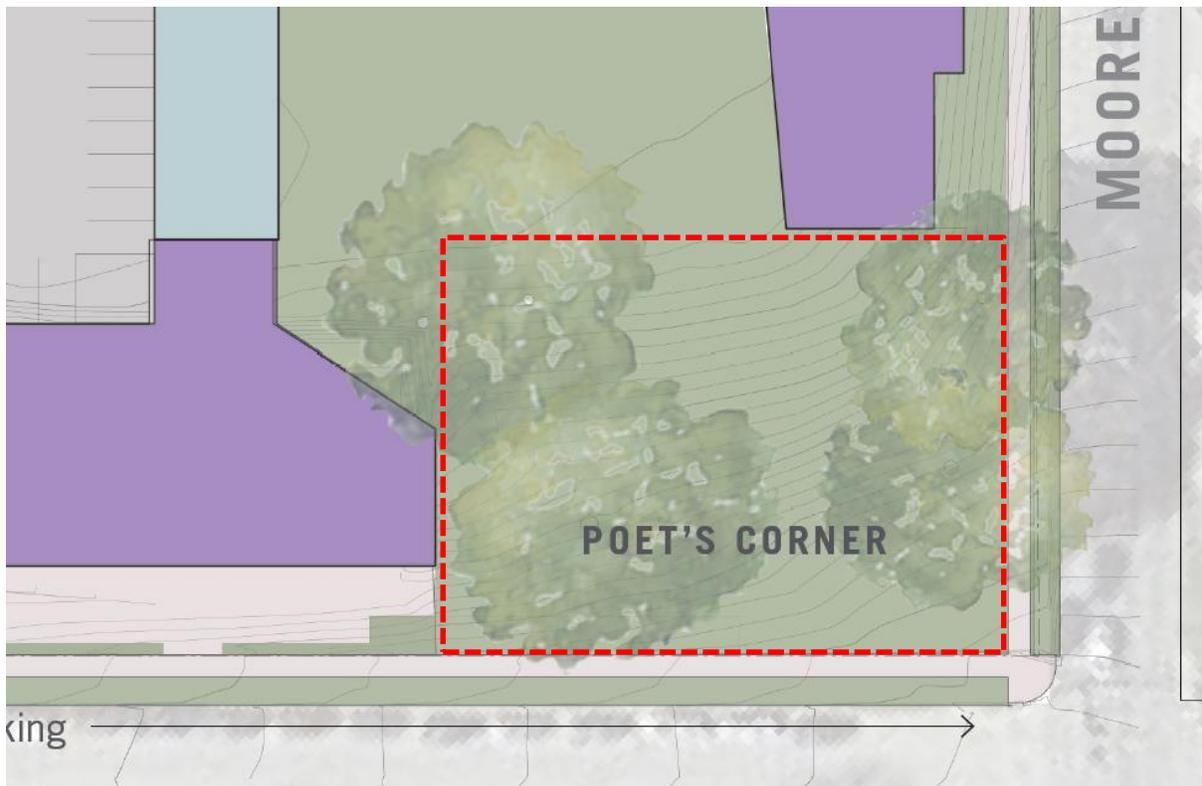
Approximate area of the Project Site to be known as Poet’s Corner is depicted in red.
